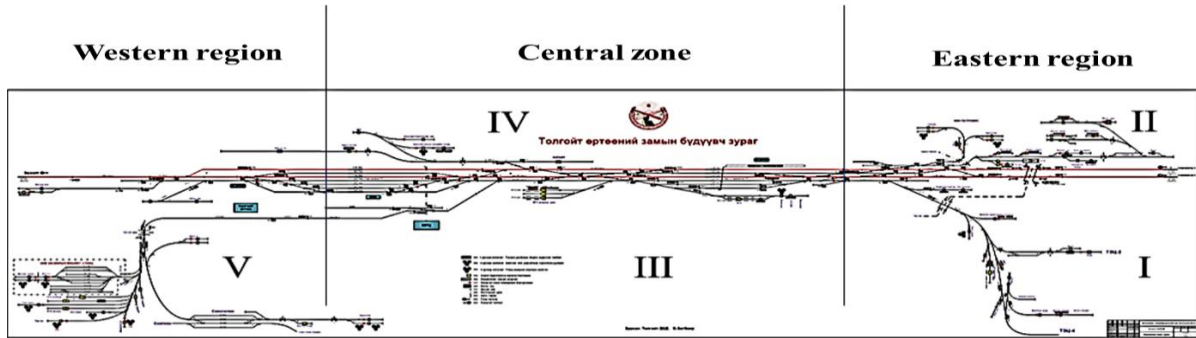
Schematic Diagram of Tolgoit Station Tracks and Sidings Divided into Zones
